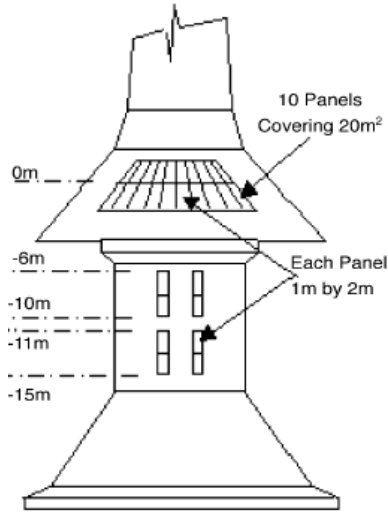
Ice Force Panels layout on the Confederation Bridge pier P31.
